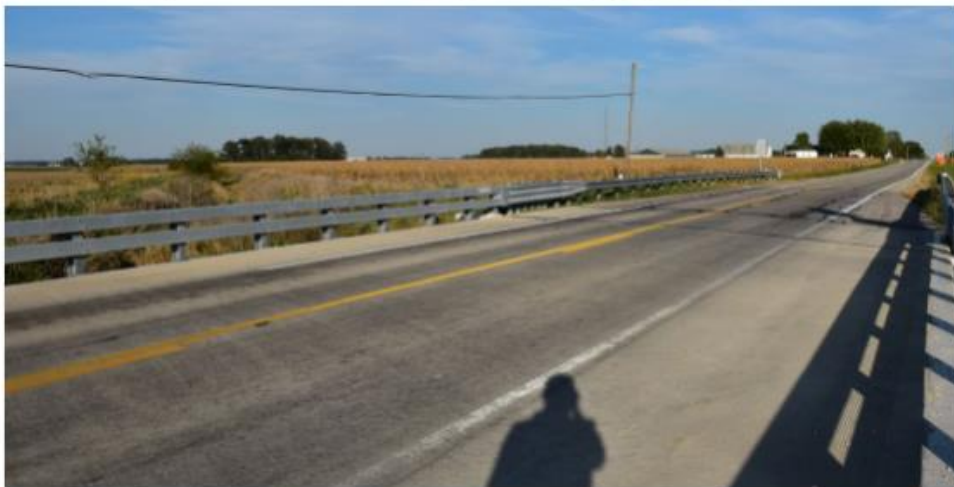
Bridge Inspection Pictures and Crack Map – DAR-705-0902
